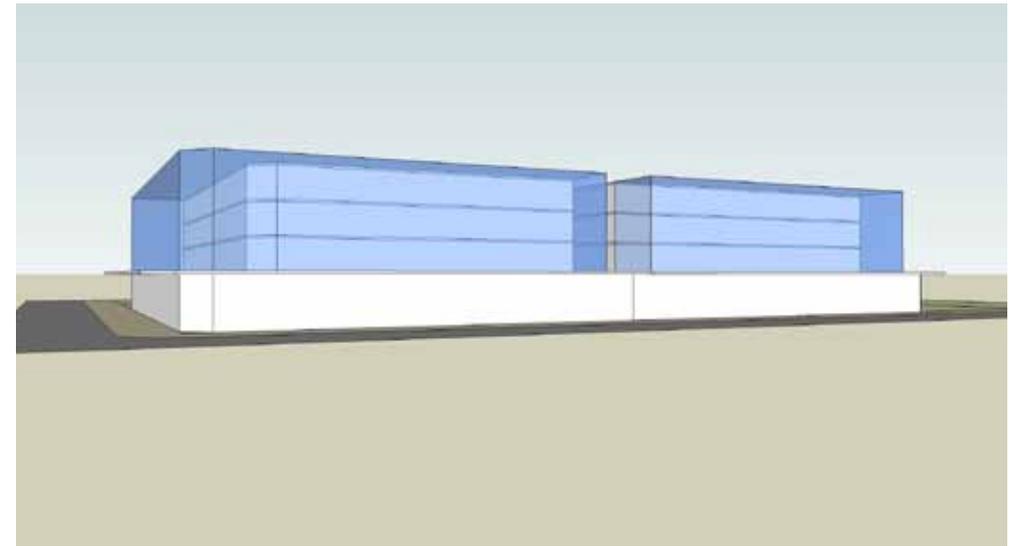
ILLUSTRATIVE PERSPECTIVE OF TYPE 2 BUILDINGS - INTERSECTION OF VICTORIA STREET AND NELSON STREET
